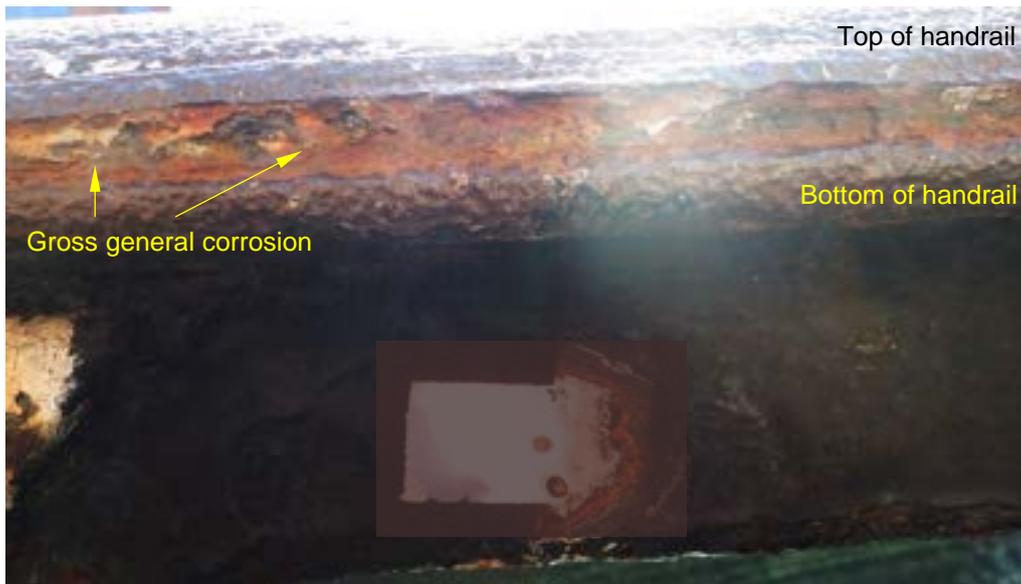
Detail of Area 1 – Handrail showing oxide jacking of top of handrail due to gross general corrosion.
